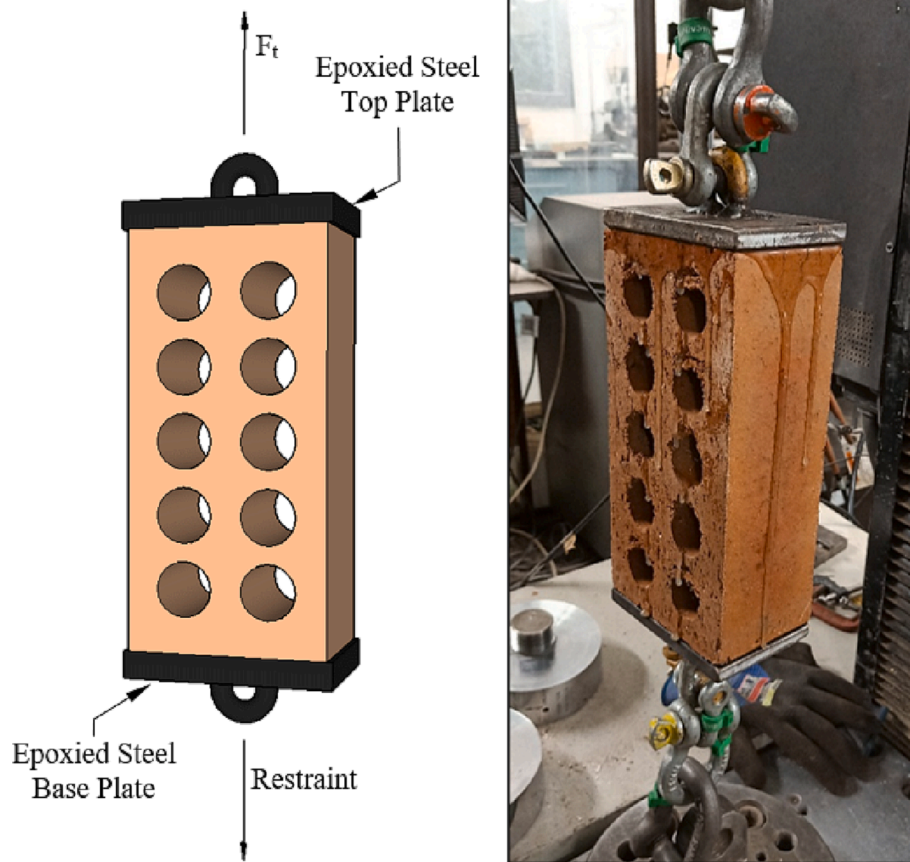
Isometric and as-constructed image of apparatus for direct tension testing of masonry units.
